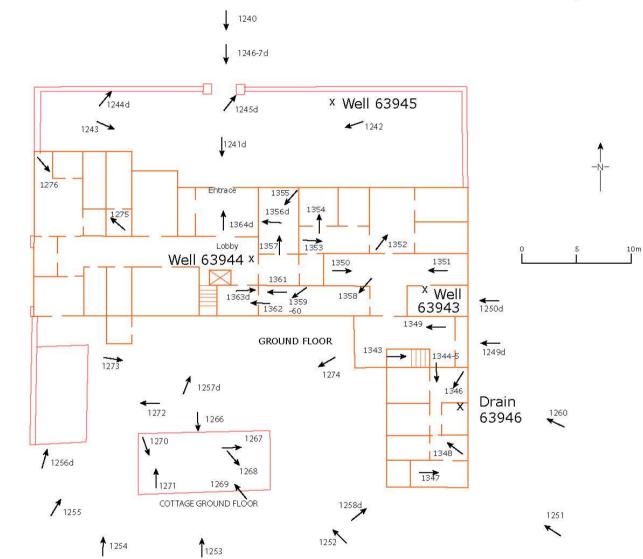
Photographic numbers and location of wells and drain. Part of ground floor and exterior. Schematic modern layout
